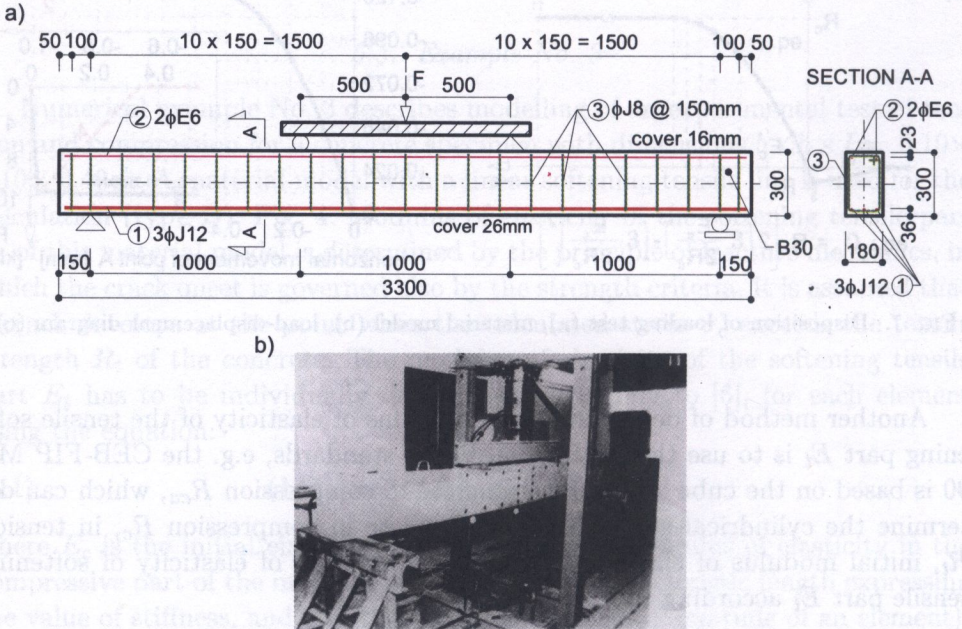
Reinforcement diagram (a) and disposition of the loading test (b).
